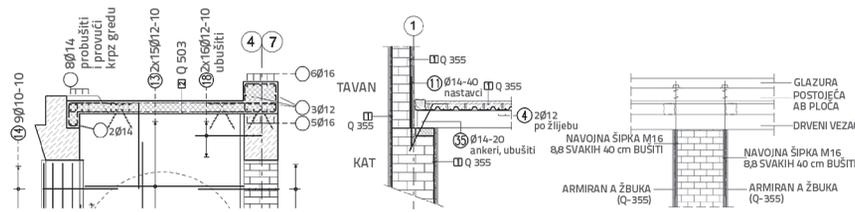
Characteristic details of strengthening the existing floor structure [12]
